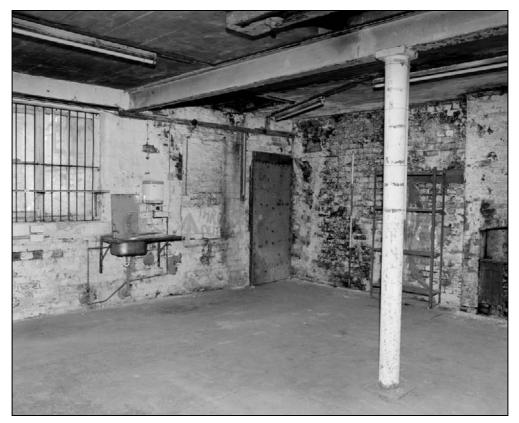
General view of F4, north range – note blocked window and stair scar (film 33.4)
